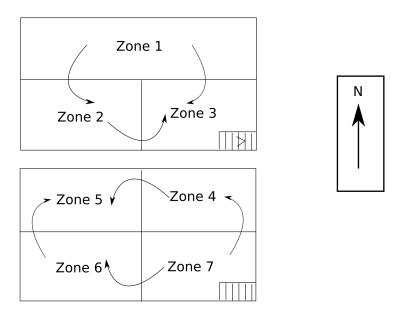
Simplified floor plans for model building and potential airflow pathways.
